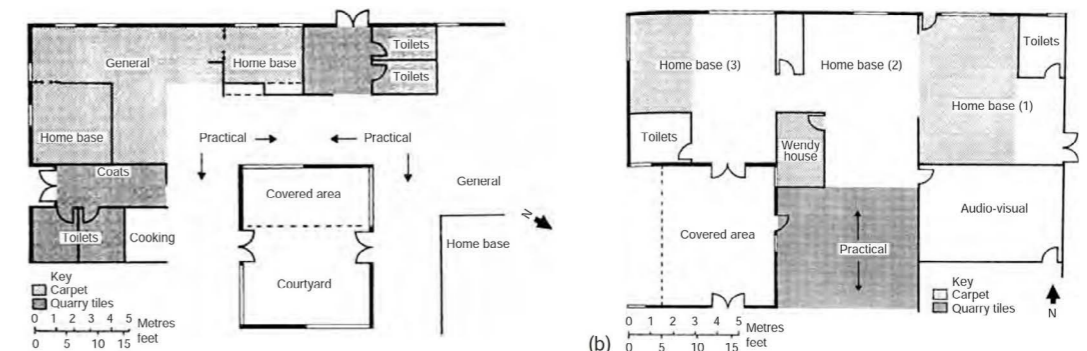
Typical open-plan classroom showing location of practical areas
